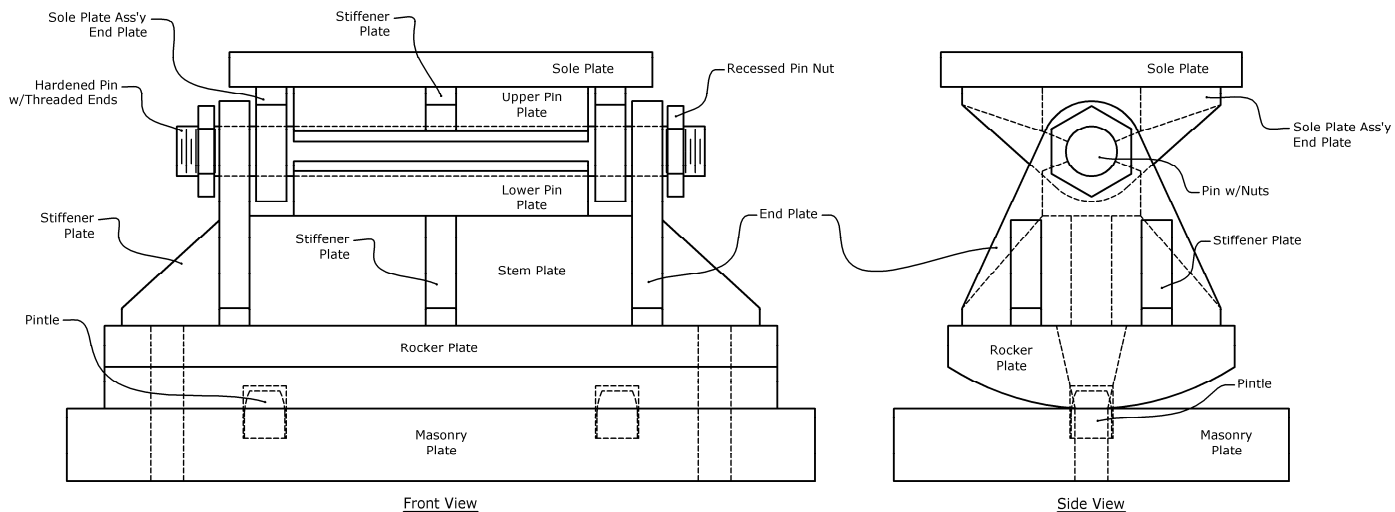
TYPICAL ROCKER "PIN" BEARING ASSEMBLY
